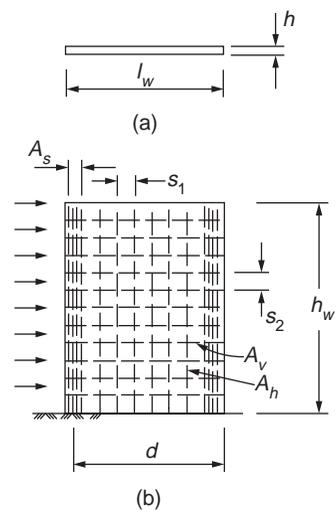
Geometry and reinforcement of typical shear wall; (a) cross section; (b) elevation.
